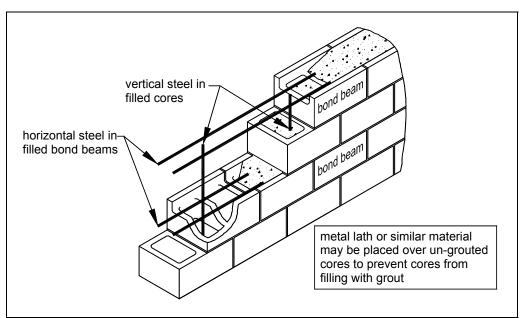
TYPICAL WALL REINFORCEMENT DETAIL
